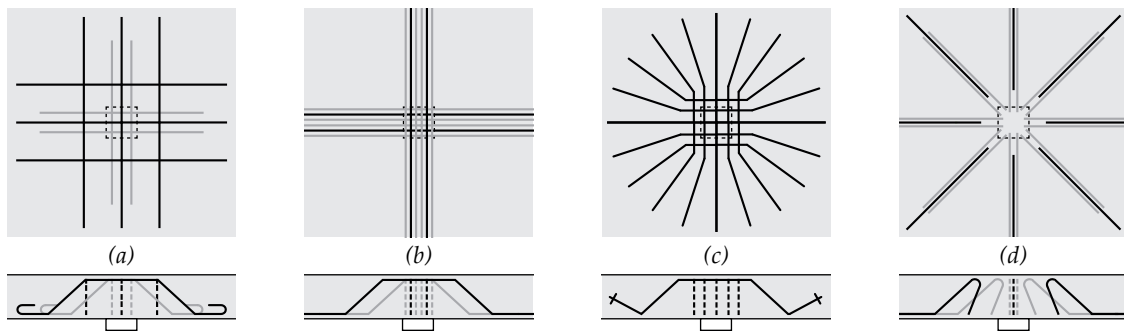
Detailing of bent-up bars as punching reinforcement: (a) with end anchorages (adapted from [Gra38]); (b) without end anchorages (adapted from [Els66]); and (c-d) alternative solutions (adapted from [And63, Ein16a])
